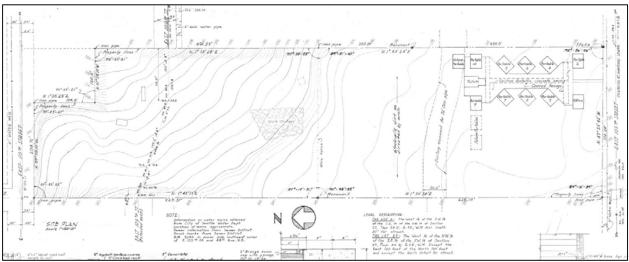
1955 site plan showing all-portables Matthews Elementary at southeast property corner. North is left. (Detail, John Rogers Elementary School, Theo Damm, sheet A-1, March 18, 1955) (SPSA)
